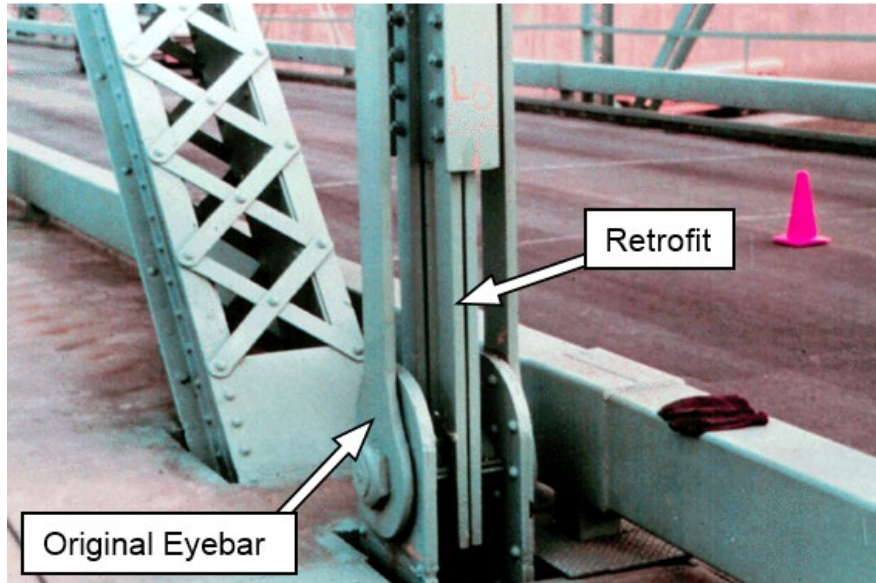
Retrofit of Eyebars to Add Redundancy
